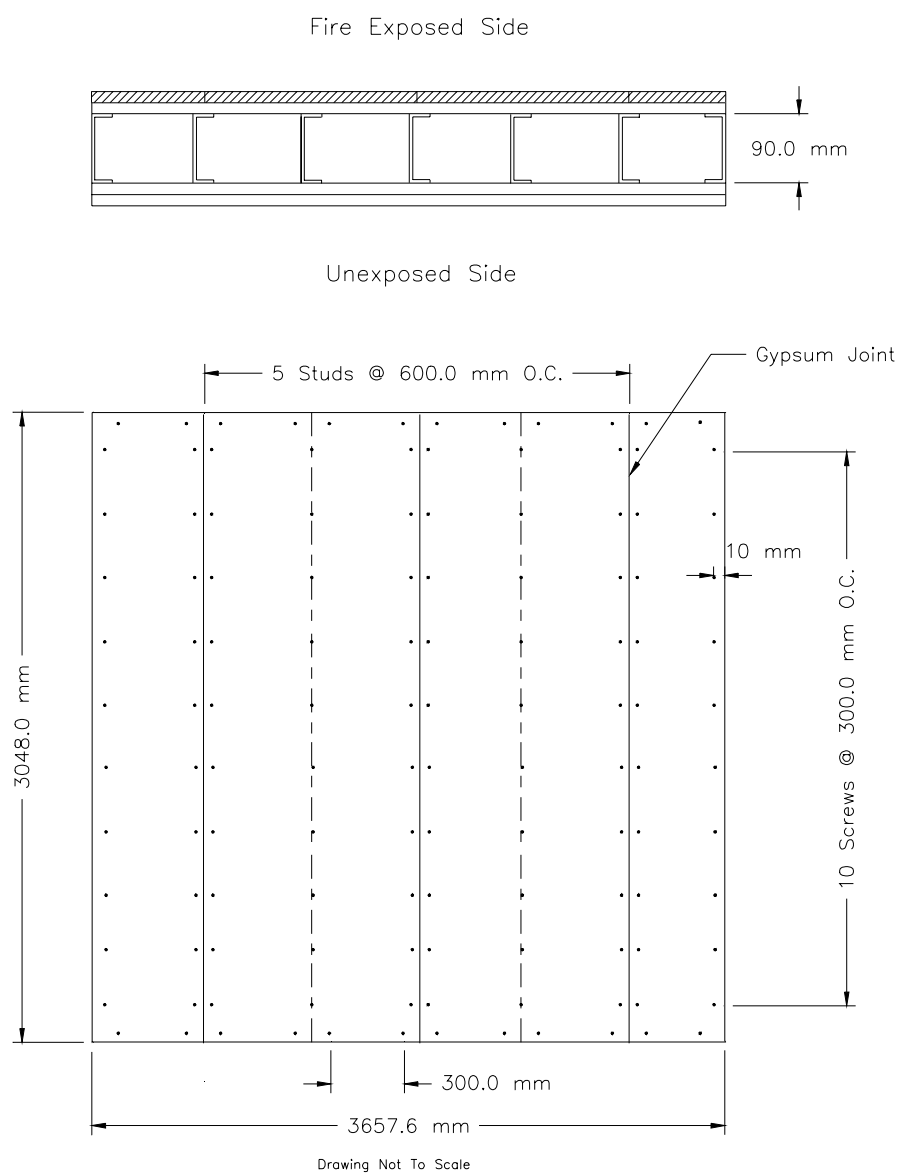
Screw Locations Steel Stud, 2x2 Gypsum Board Layers, Full-Scale Assembly (Face Layer, Exposed Side)
